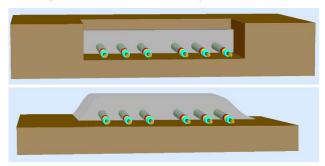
Concepts for shallow cable installation with shallow trench (top) and soil berm (bottom)
